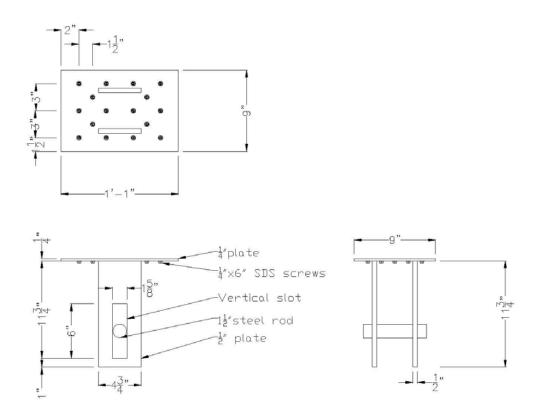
Detailed drawing for shear transfer connection for Rocking CLT wall panel
